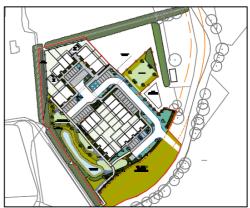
Proposed Landscape Plan, drawing P608-102 Landscape Plan
